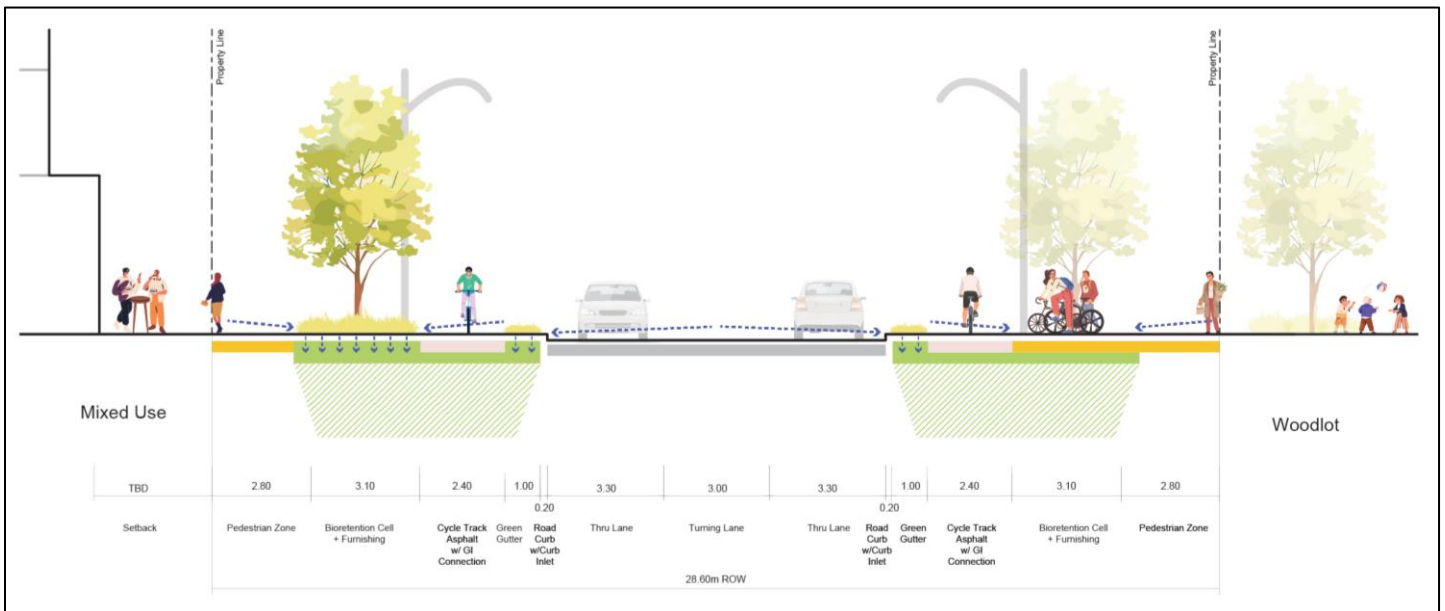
Northern Street (Keele Street to Sheppard Avenue West) Cross-Section – Option 2
